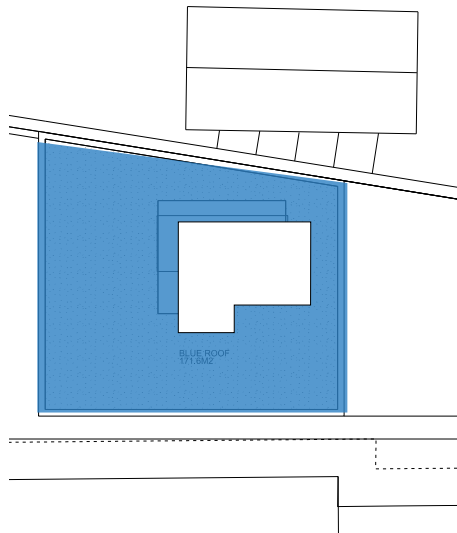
Tenth Floor Plan - Roof Top Smoke Extract
